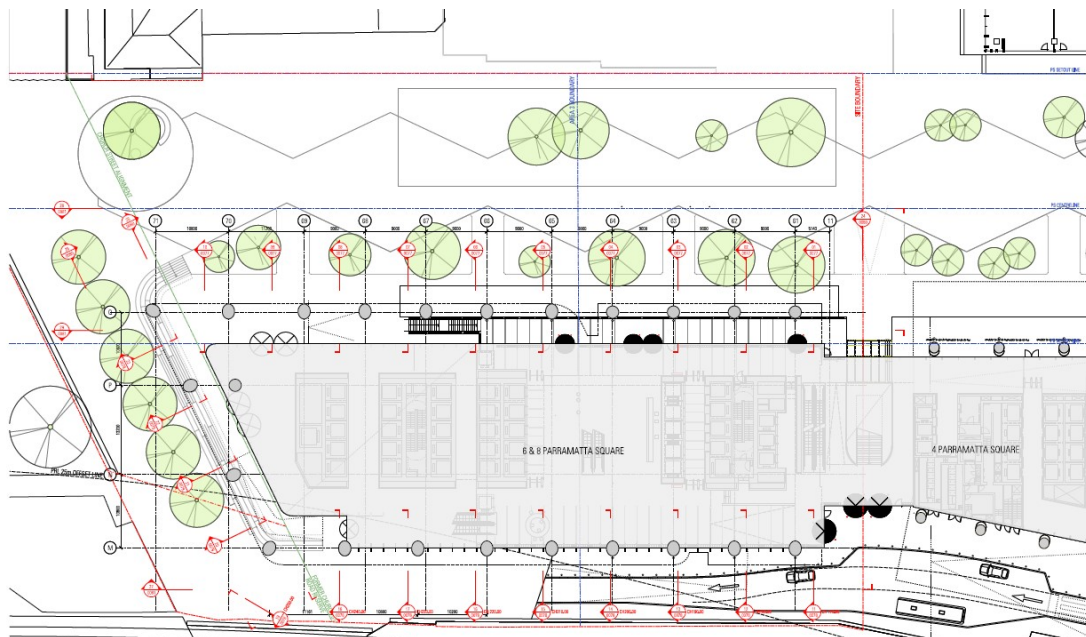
Upper Ground Floor Public Domain Alignment Plan
